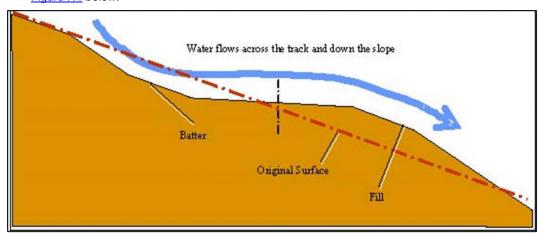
Access Track Infrastructure - Out Slope Formation Details
